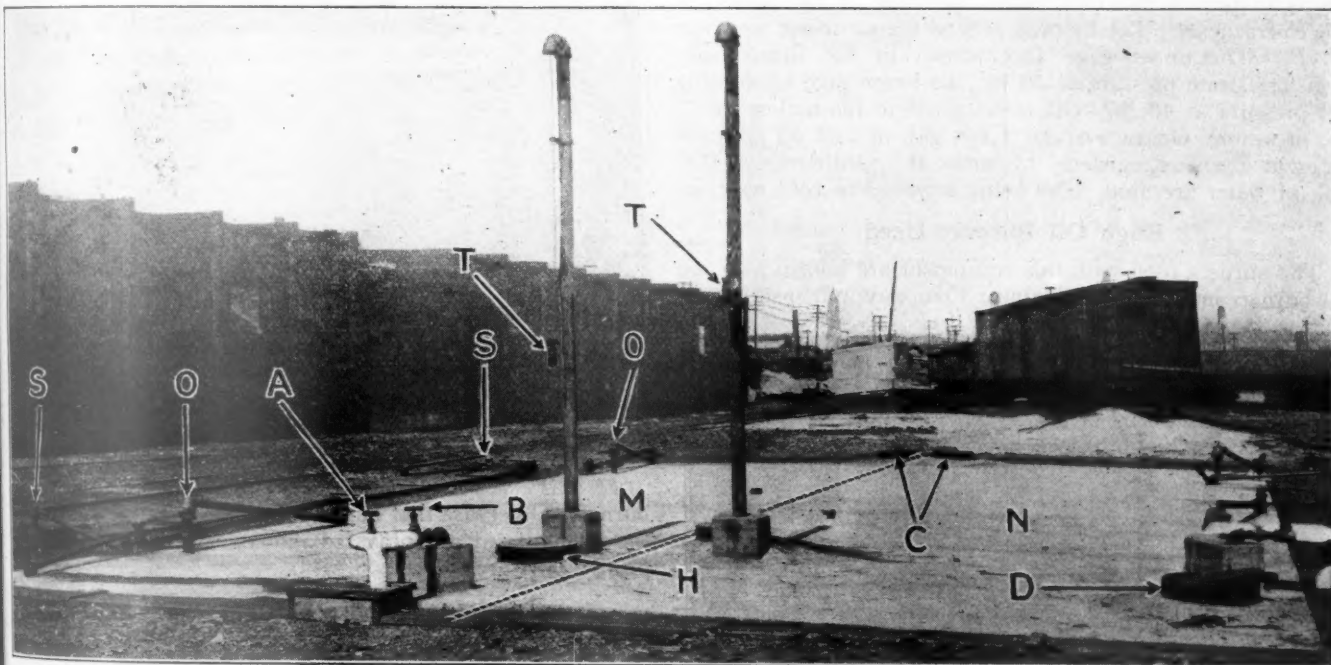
General View of Oil Storage Tank with Telltales Indicating the Two Sections to Be About One-Half Full of Oil
